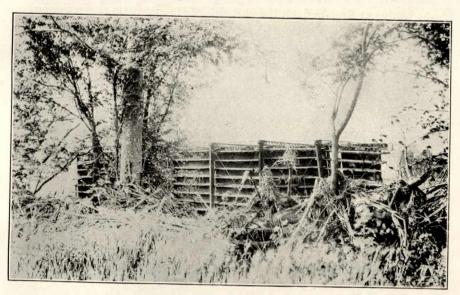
A thirty-foot bridge that was carried a half mile down stream from the public road north of Brownstown.
